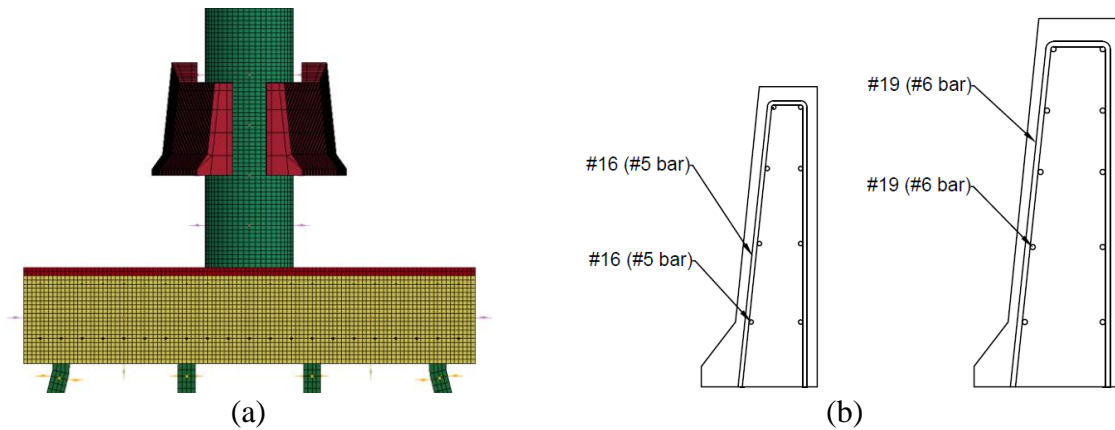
Frame pier model with barrier: (a) view of barrier's longitudinal axis, and (b) cross-sections of barrier
